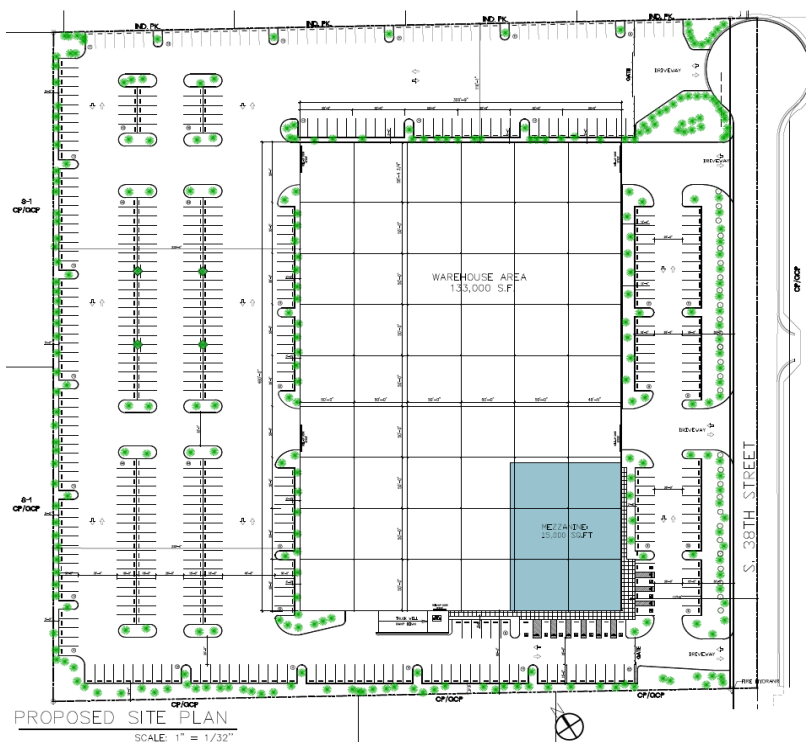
Figure C. (Above) Site Plan, Source: John G. Cataldo, Architecture
